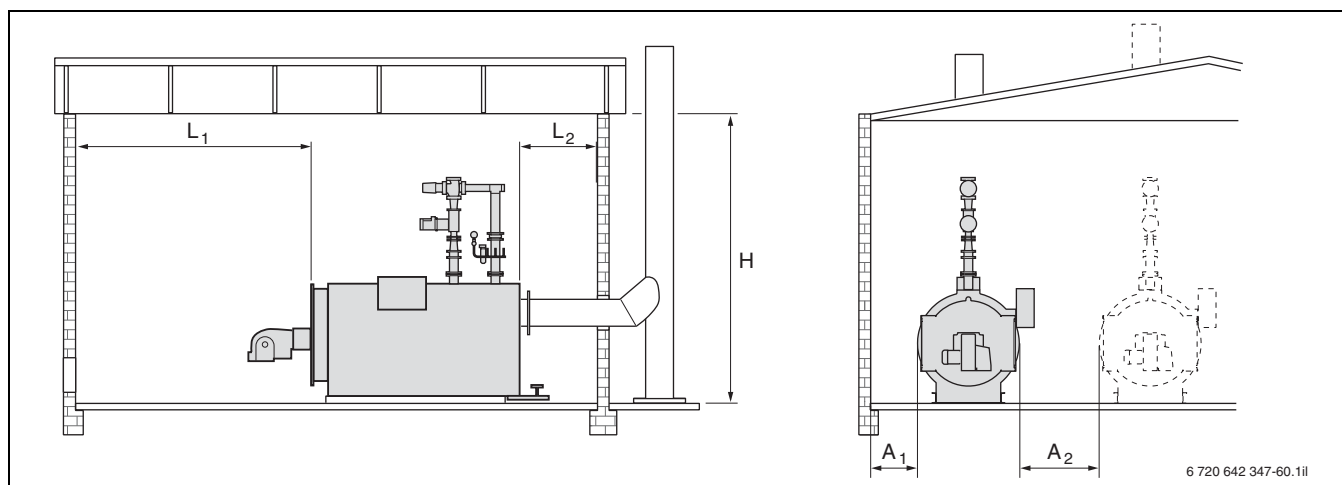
UNIMAT UT-L boiler installation room dimensions
